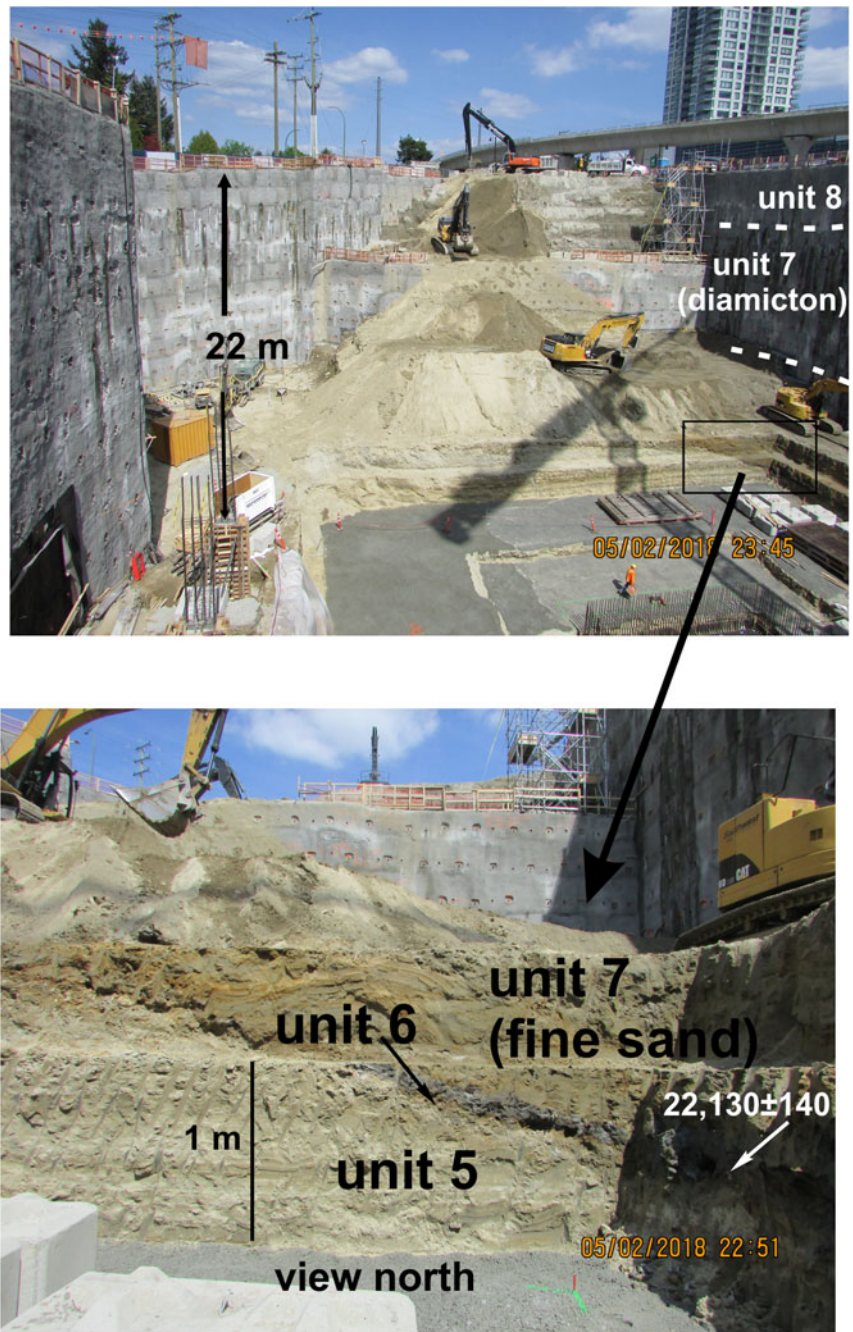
Apartment tower basement excavation at 567 Clarke Road, 400 m south of the south tunnel portal. Top, Unit 7 diamiction and gravel are overlain by unit 8. Stratigraphy was projected onto the shotcrete-covered wall from a light rail transit guideway boring (Golder Associates, 2010; core BH09-201). Bottom, The calibrated age of the peat bed constrains it to unit 6.
